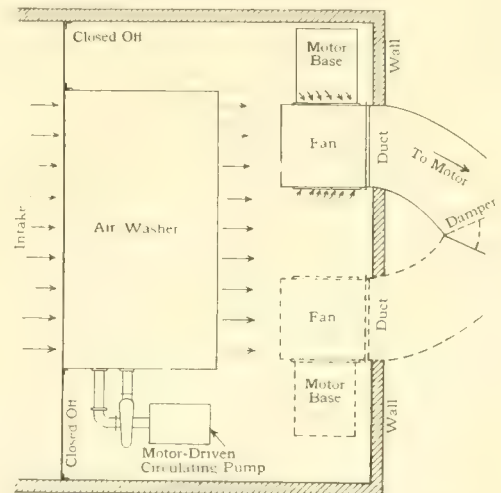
LAYOUT OF VENTILATING SYSTEM FOR MILL MOTORS
